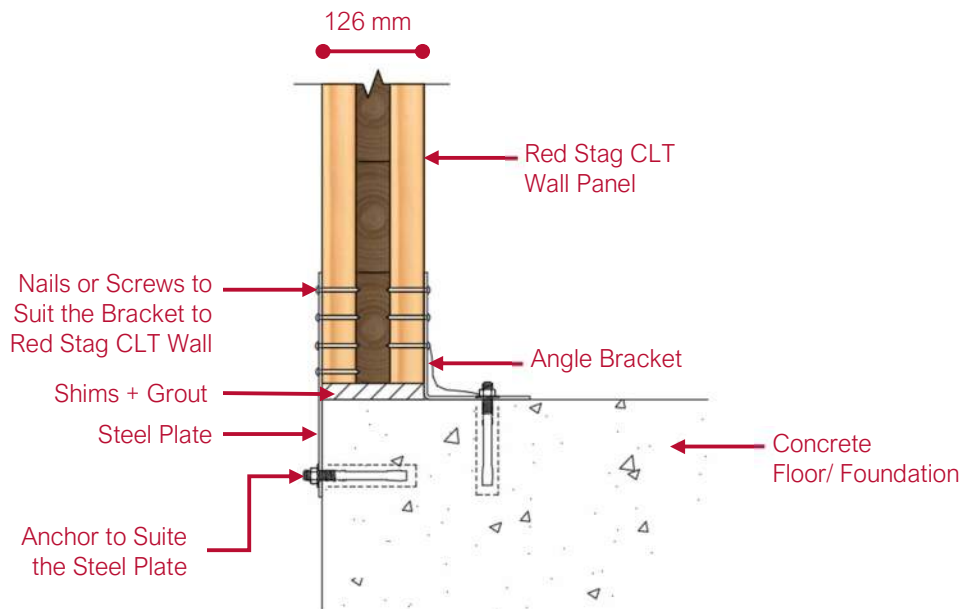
Red Stag CLT wall panel to the concrete foundation/floor (On edge of external walls of the building).
